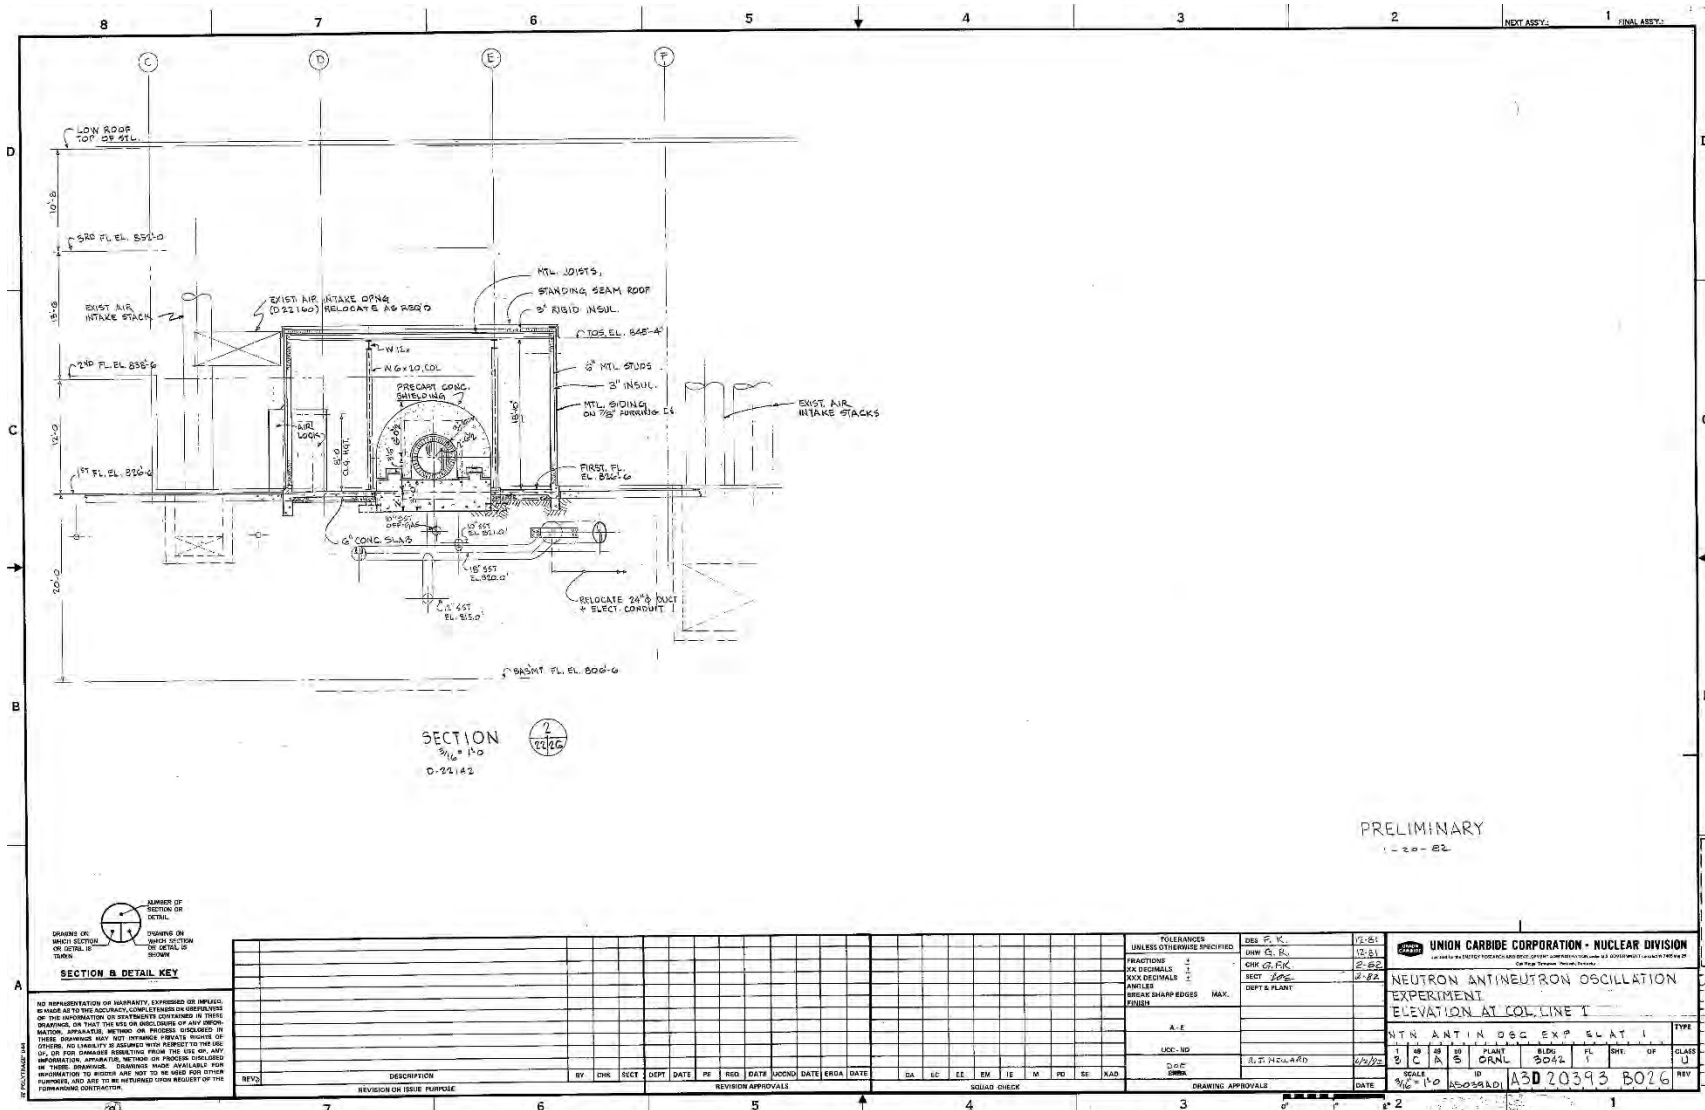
Preliminary drawing of an elevation pertaining to the neutron antineutron oscillation experiment proposed for construction on the south elevation of Building 3042 (Union Carbide Corporation, December 1981).
